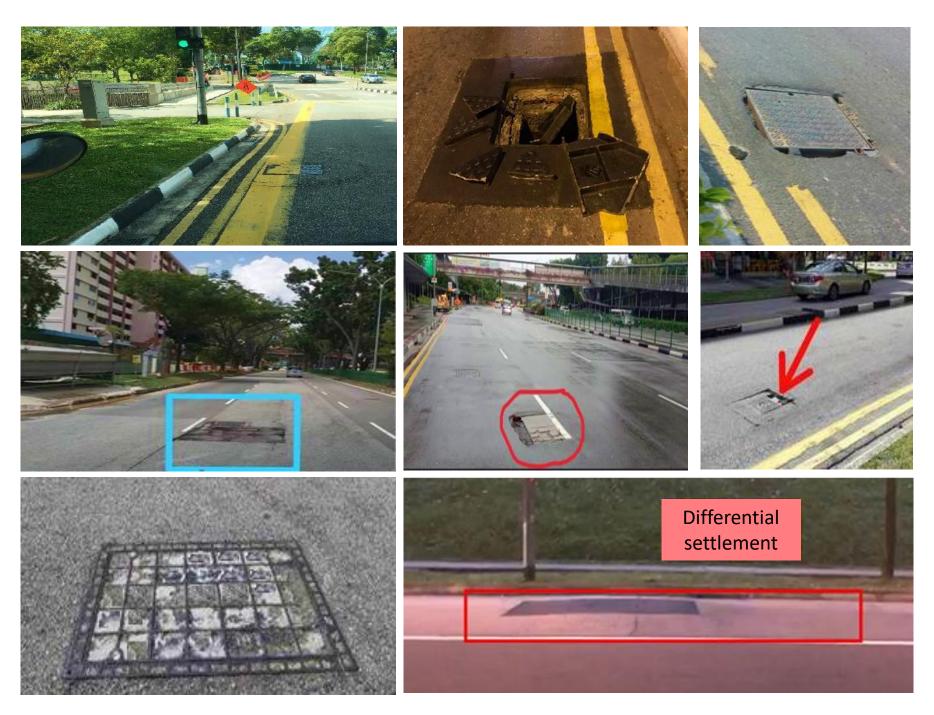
Safety Hazards on Road Carriageway due to Manholes
